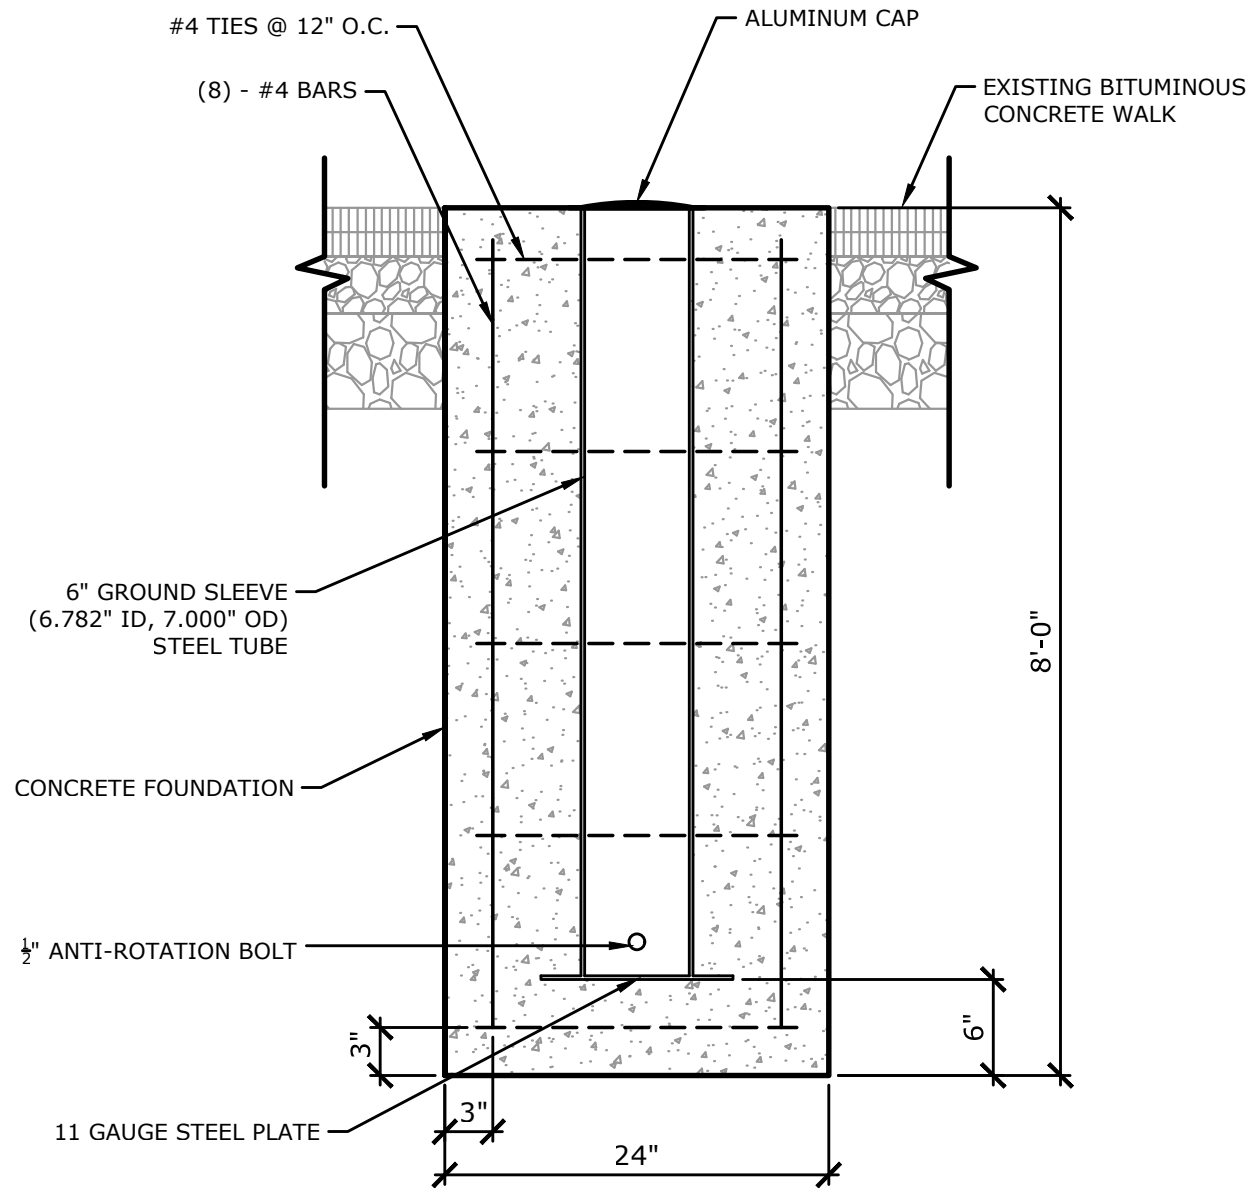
Foundation Detail (for 60' Poles - Alternate):
